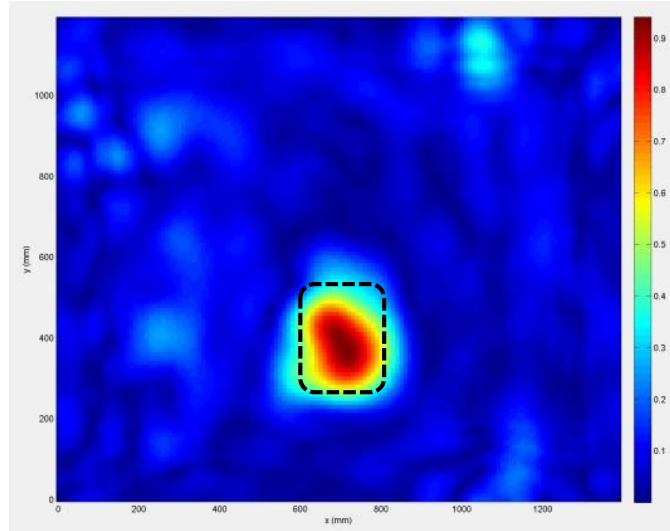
2D the back surface image slice of the concrete MSW wall section after subtraction
